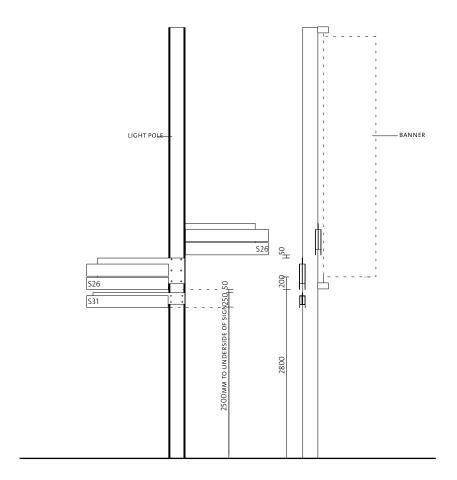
(EXAMPLE 1) elevation sign mounted to light pole
